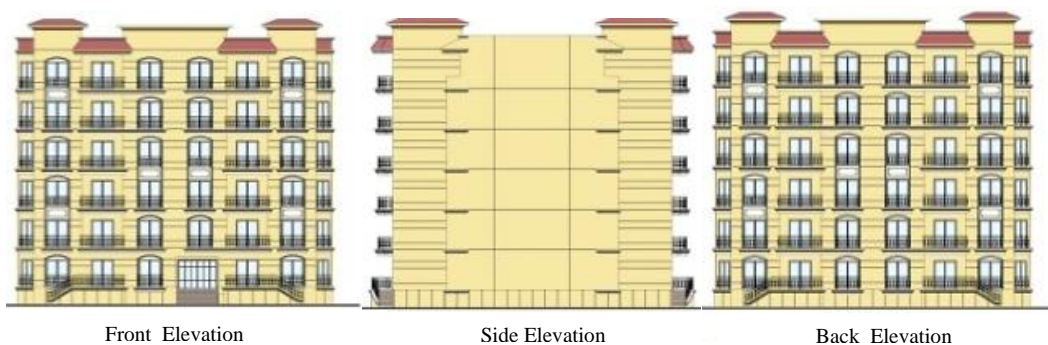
Example of buildings' elevation within Al Rehab City
